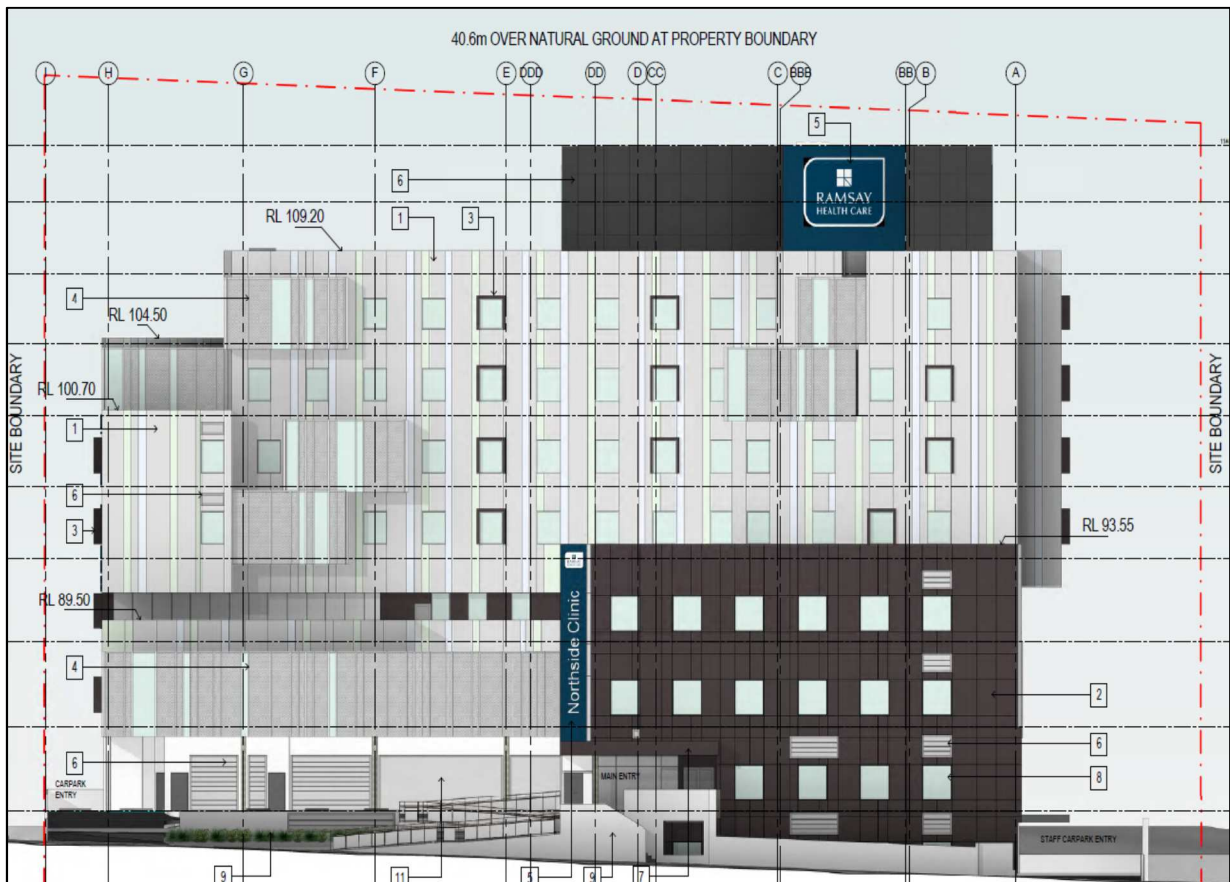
Northern Elevation (Fronting Frederick Street) (source: EIS)
